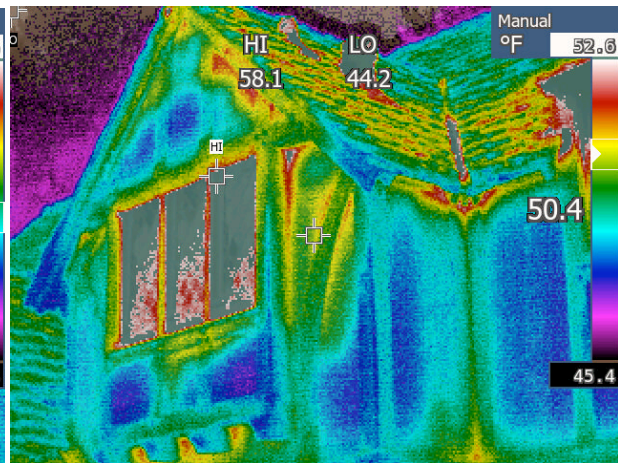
P2 Exterior thermal bridges and leakage at front of building
